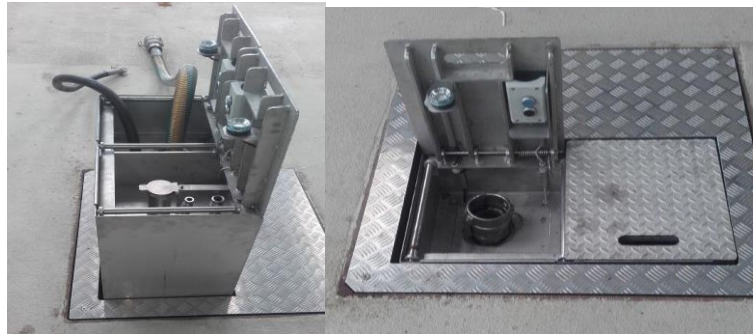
Disposal network Type 2000: Single underground – Heavy
